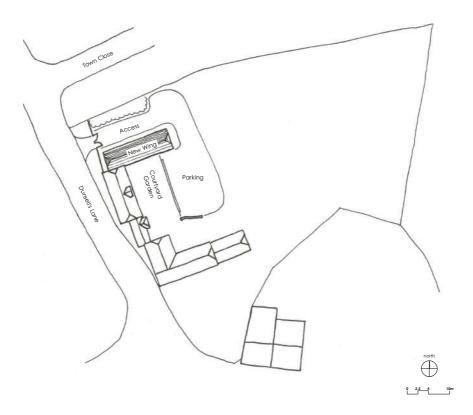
; Sketch of the proposed site plan, illustrating the position of the proposed wing to provide additional, accessible, bedrooms.
